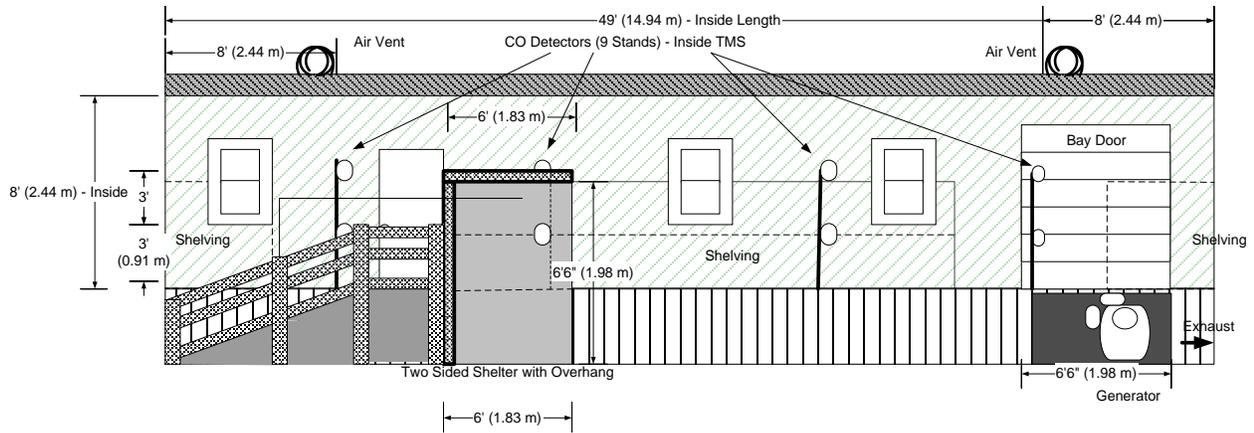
Elevation View: Setup for Tests Conducted Under TMS in Crawlspace
